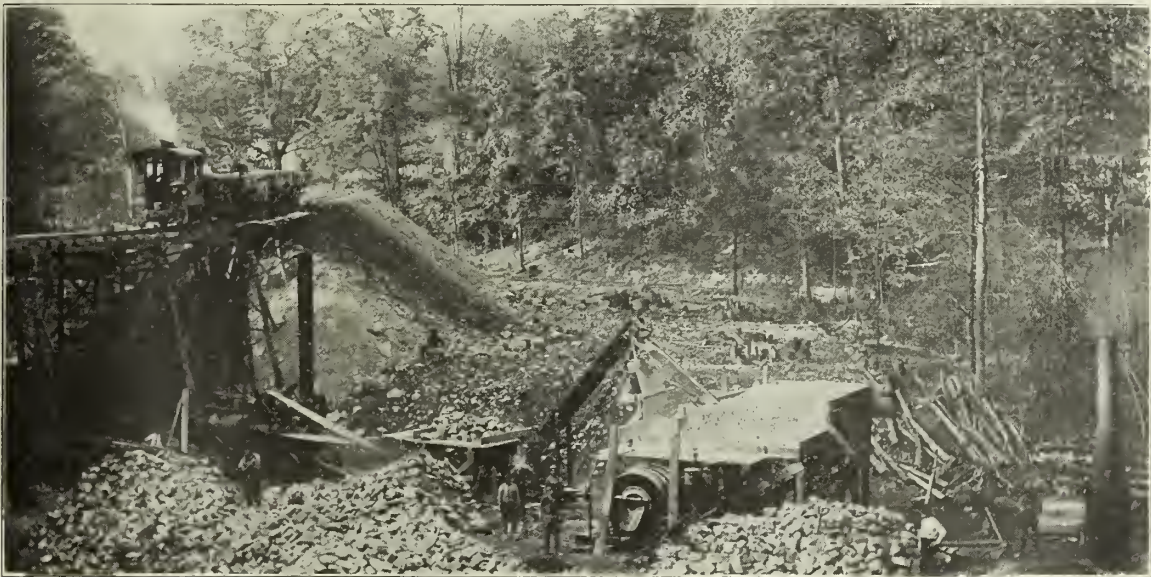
Progress View of Work on 15-Foot Concrete Arch Over Town Line Run, at Markleton, Pa.
